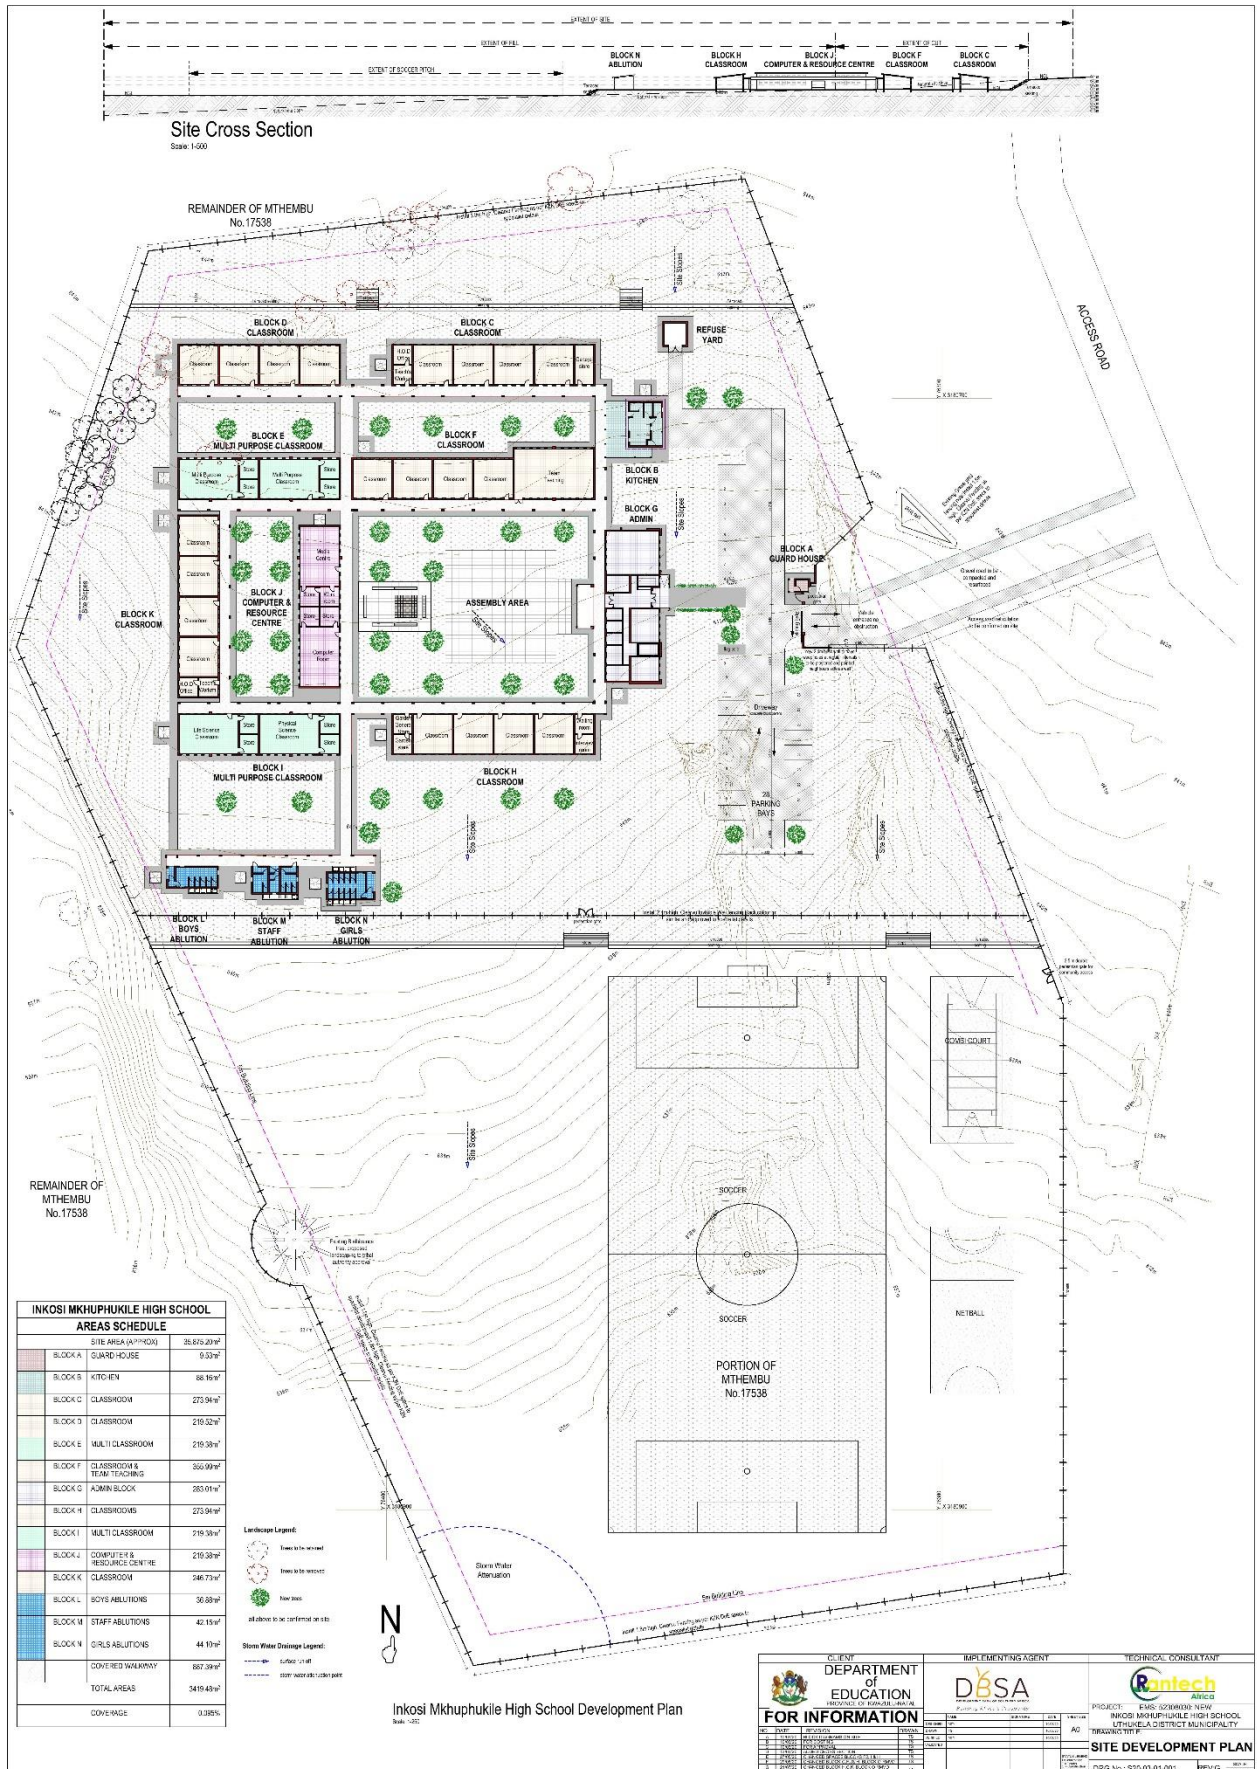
The proposed Layout designs (refer to Appendix A for A3 maps).
